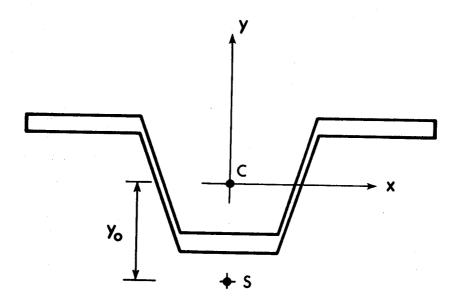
TYPICAL HAT SHAPED SECTION
